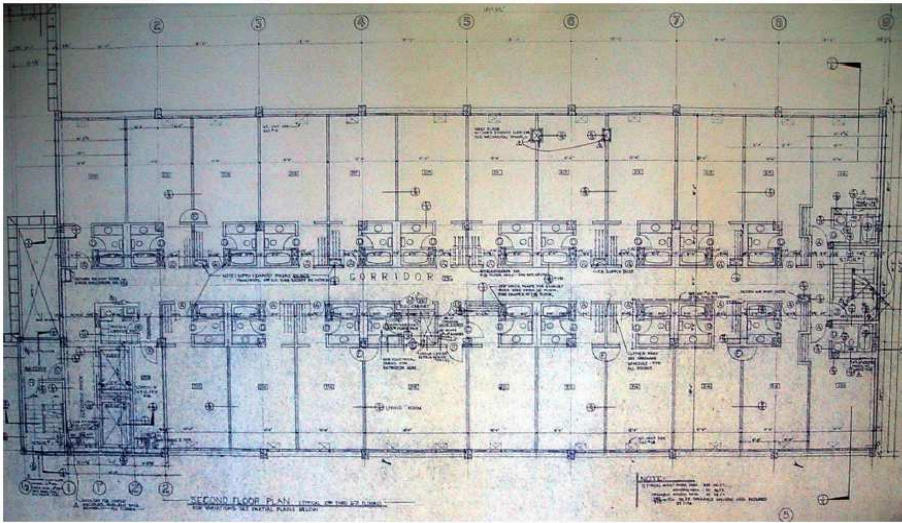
Second floor architectural plan (Rissman and Rissman Associates)
